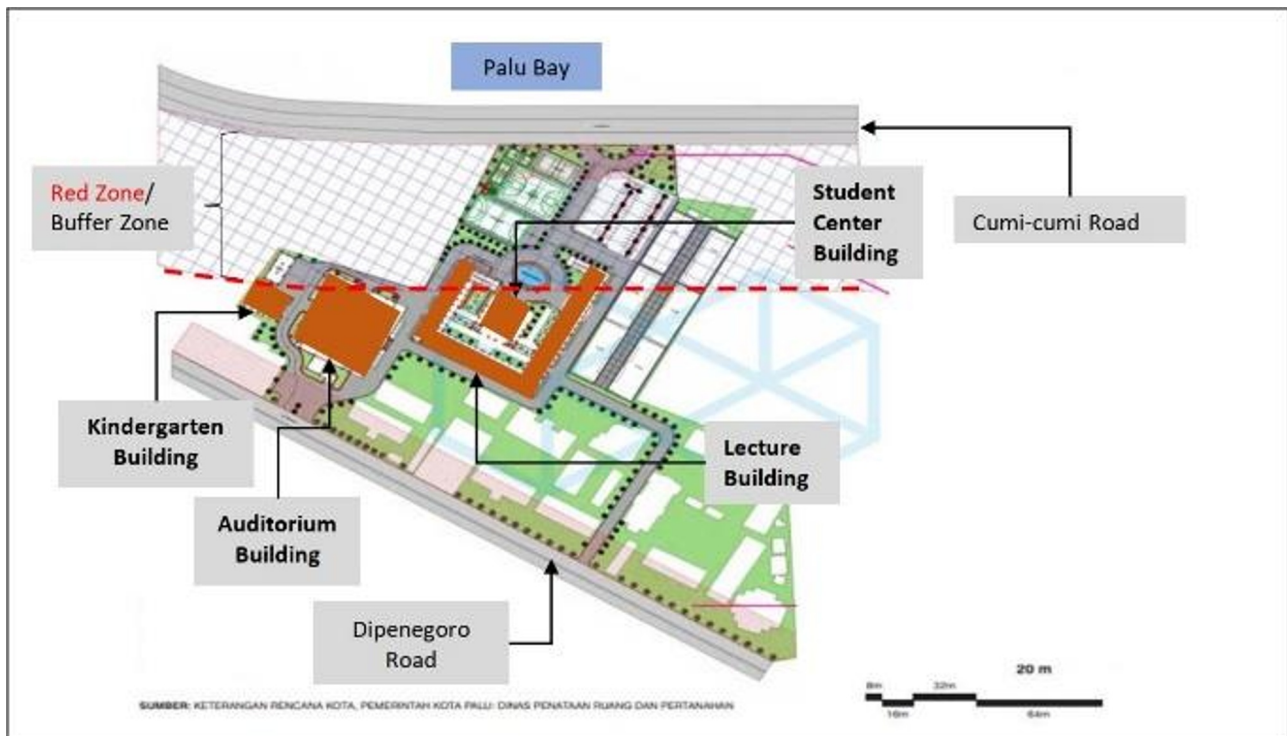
Layout plan for UIN Datokarama reconstruction [1].
